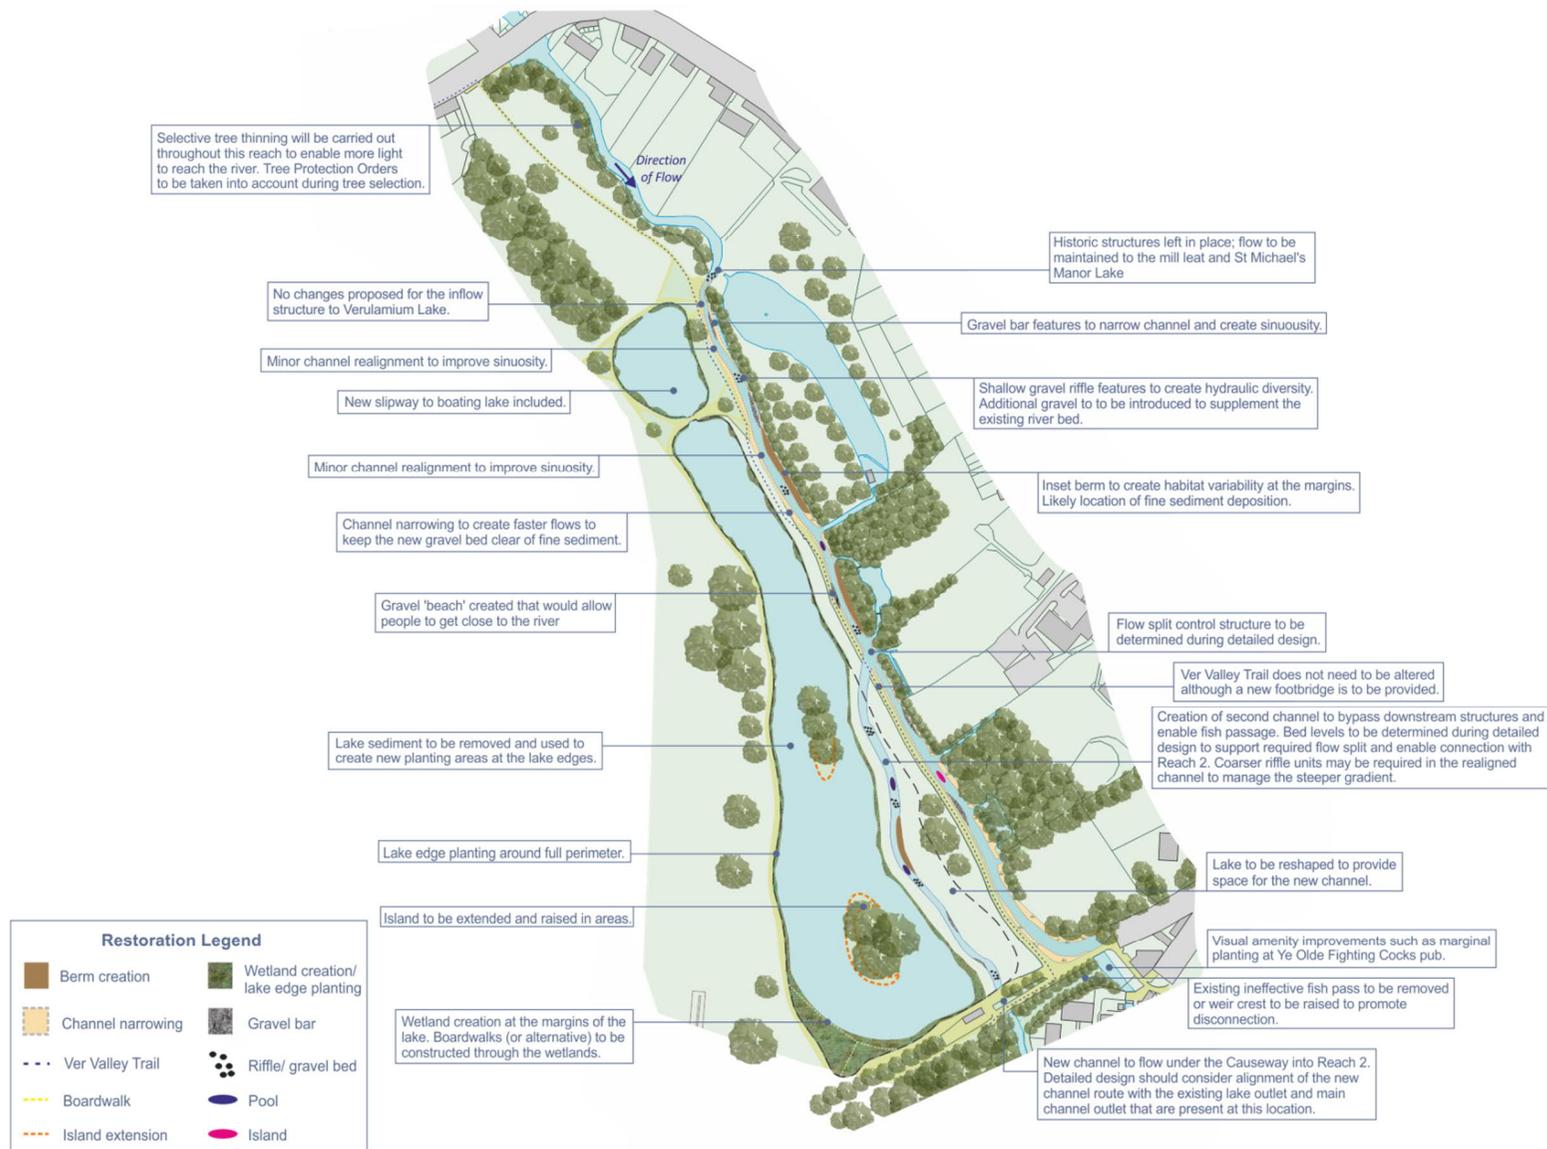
Reach 1 Final Outline Proposal Plan (post engagement)
